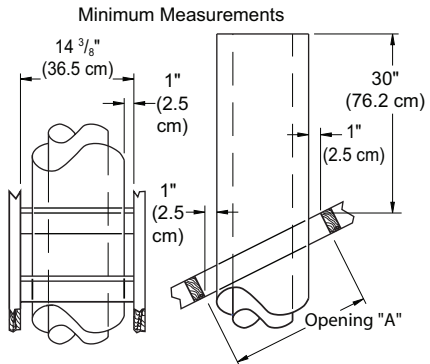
Use a Firestop Thimble Assembly for Cathedral Ceiling, Insulation Barrier and Roof
